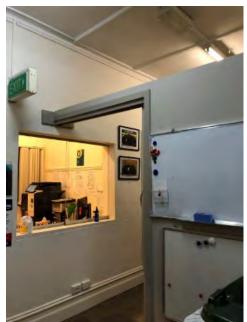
Ground floor of Plume House, including original walls and skirtings, and later partitions, ceiling and carpet lining to the floor.
